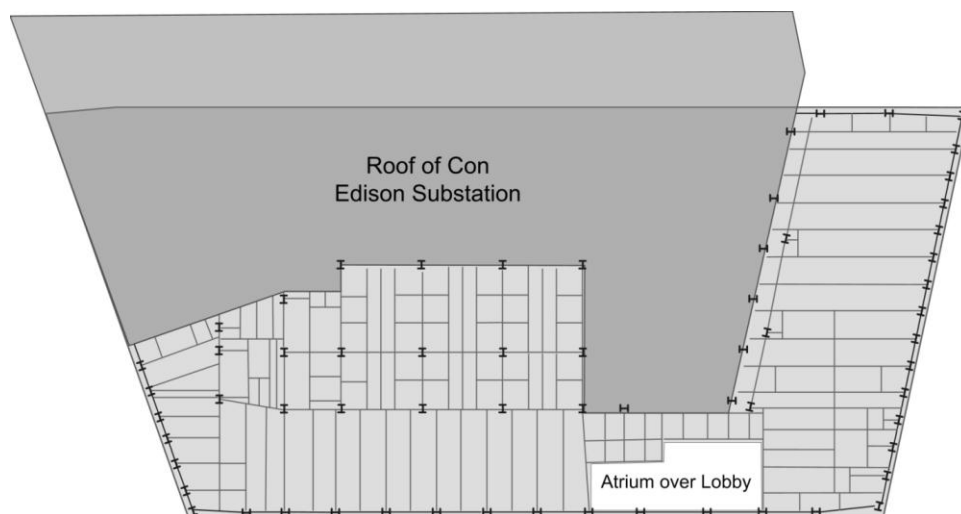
Floor 3 framing plan [2]. Based on structural drawings [15].
